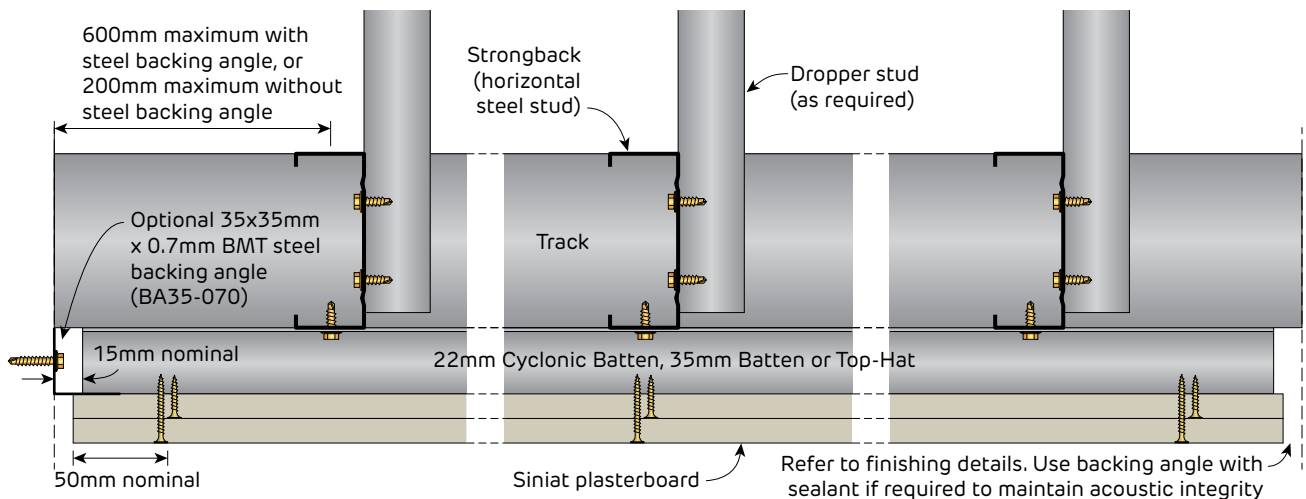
Stud Ceiling Type C2 - Batten End Detail
